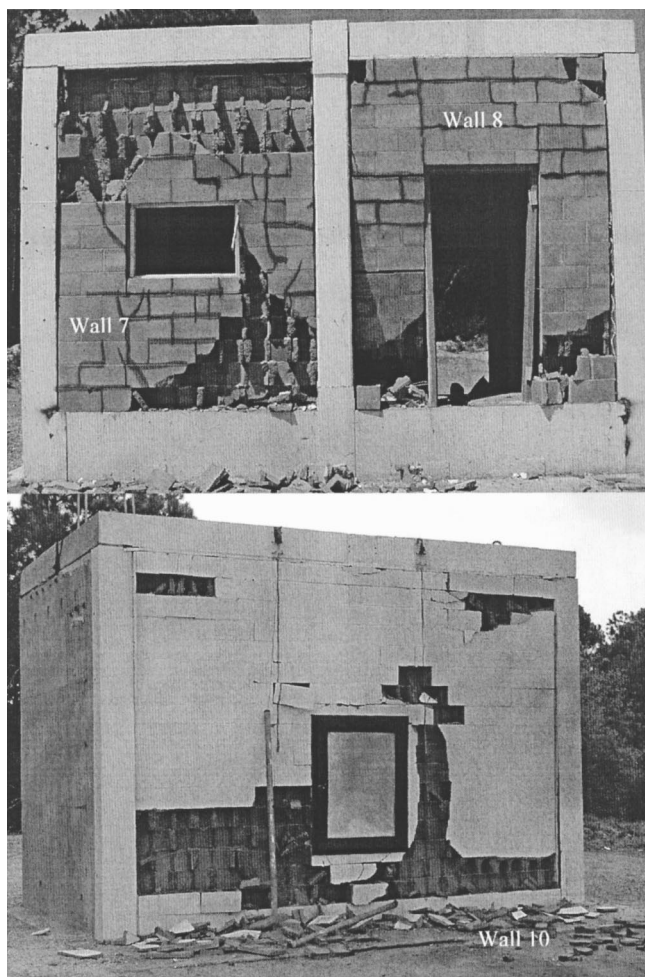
Posttest configuration of Walls 7, 8, and 10
